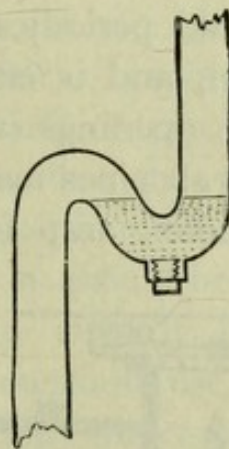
Siphon Sink Trap with movable screw for cleaning.
